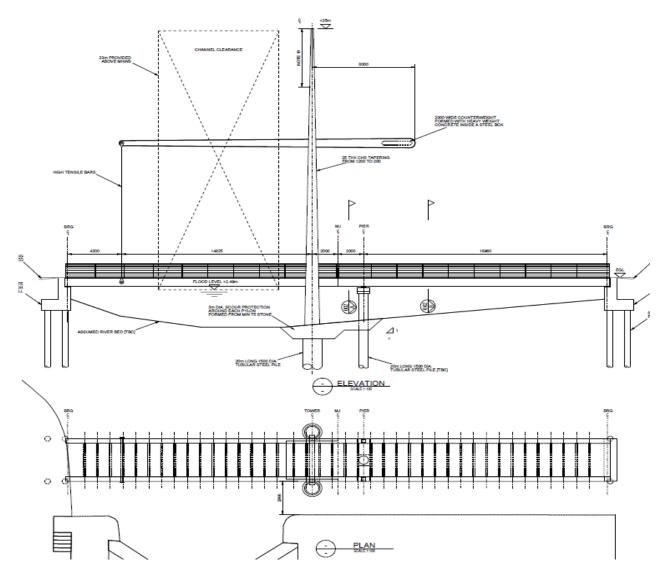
Indicative layout for Lighterage Quay lifting bridge showing required length and spans
